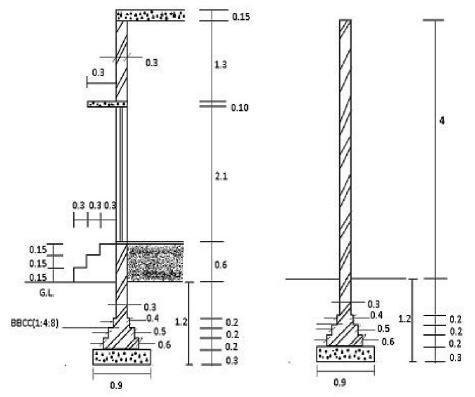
SECTION OF DEFENSE TRAINING CENTRE (BUILDING + COMPOUND WALL)
